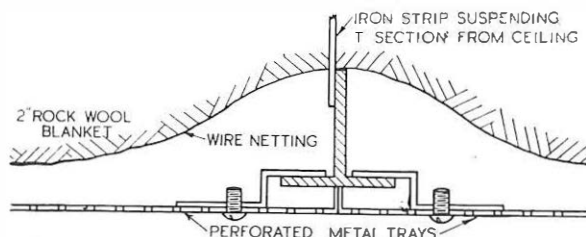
ROCK WOOL WITH PERFORATED METAL FACING SHEET.
